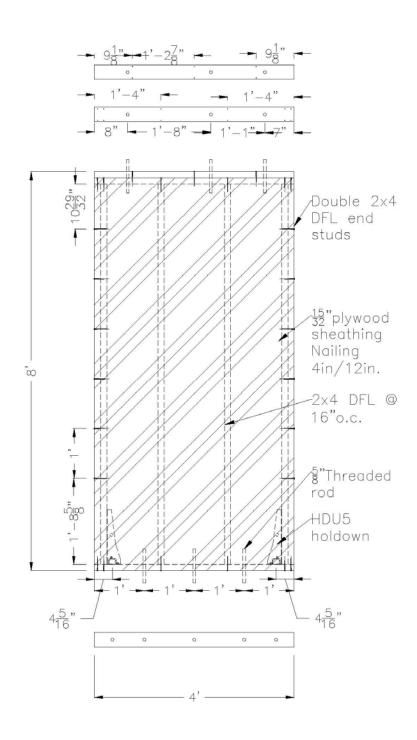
Detailed elevation drawing of typical LiFS wall
